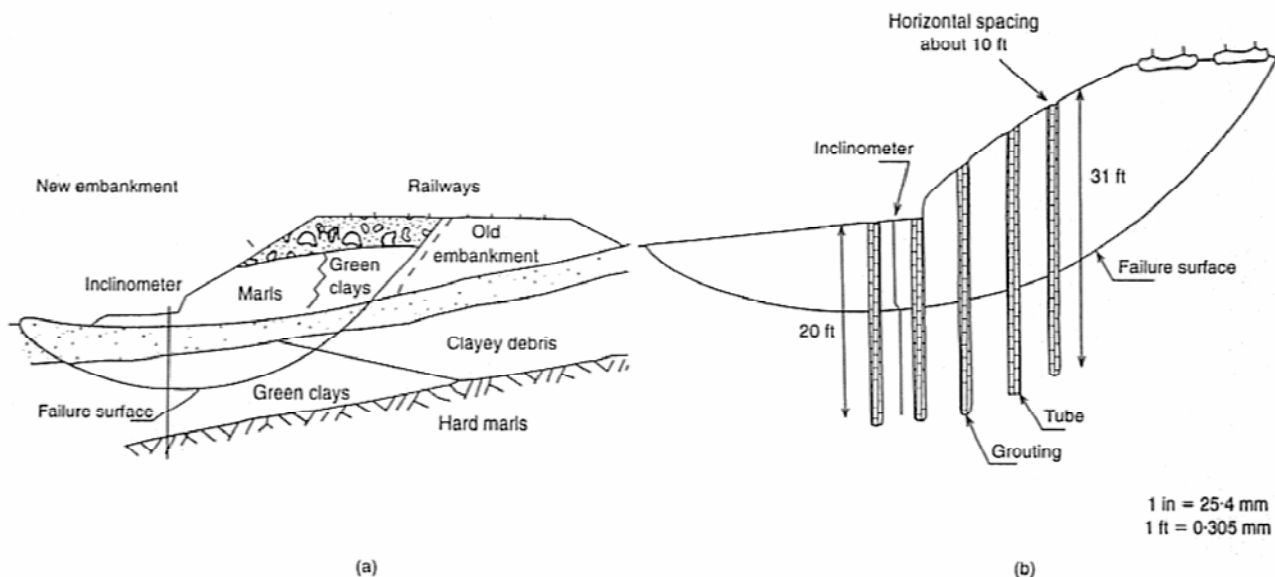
Case study illustrating the use of limit stability analysis approach for slope reinforcement design practice: (a) geotechnical cross-section of a railway embankment; (b) sliding-slope stabilization by micropiles
